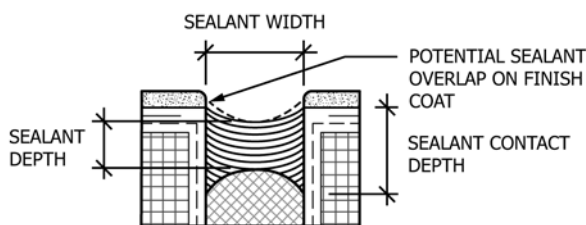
Typical Butt Type Sealant Joint Cross-Section in EIFS
